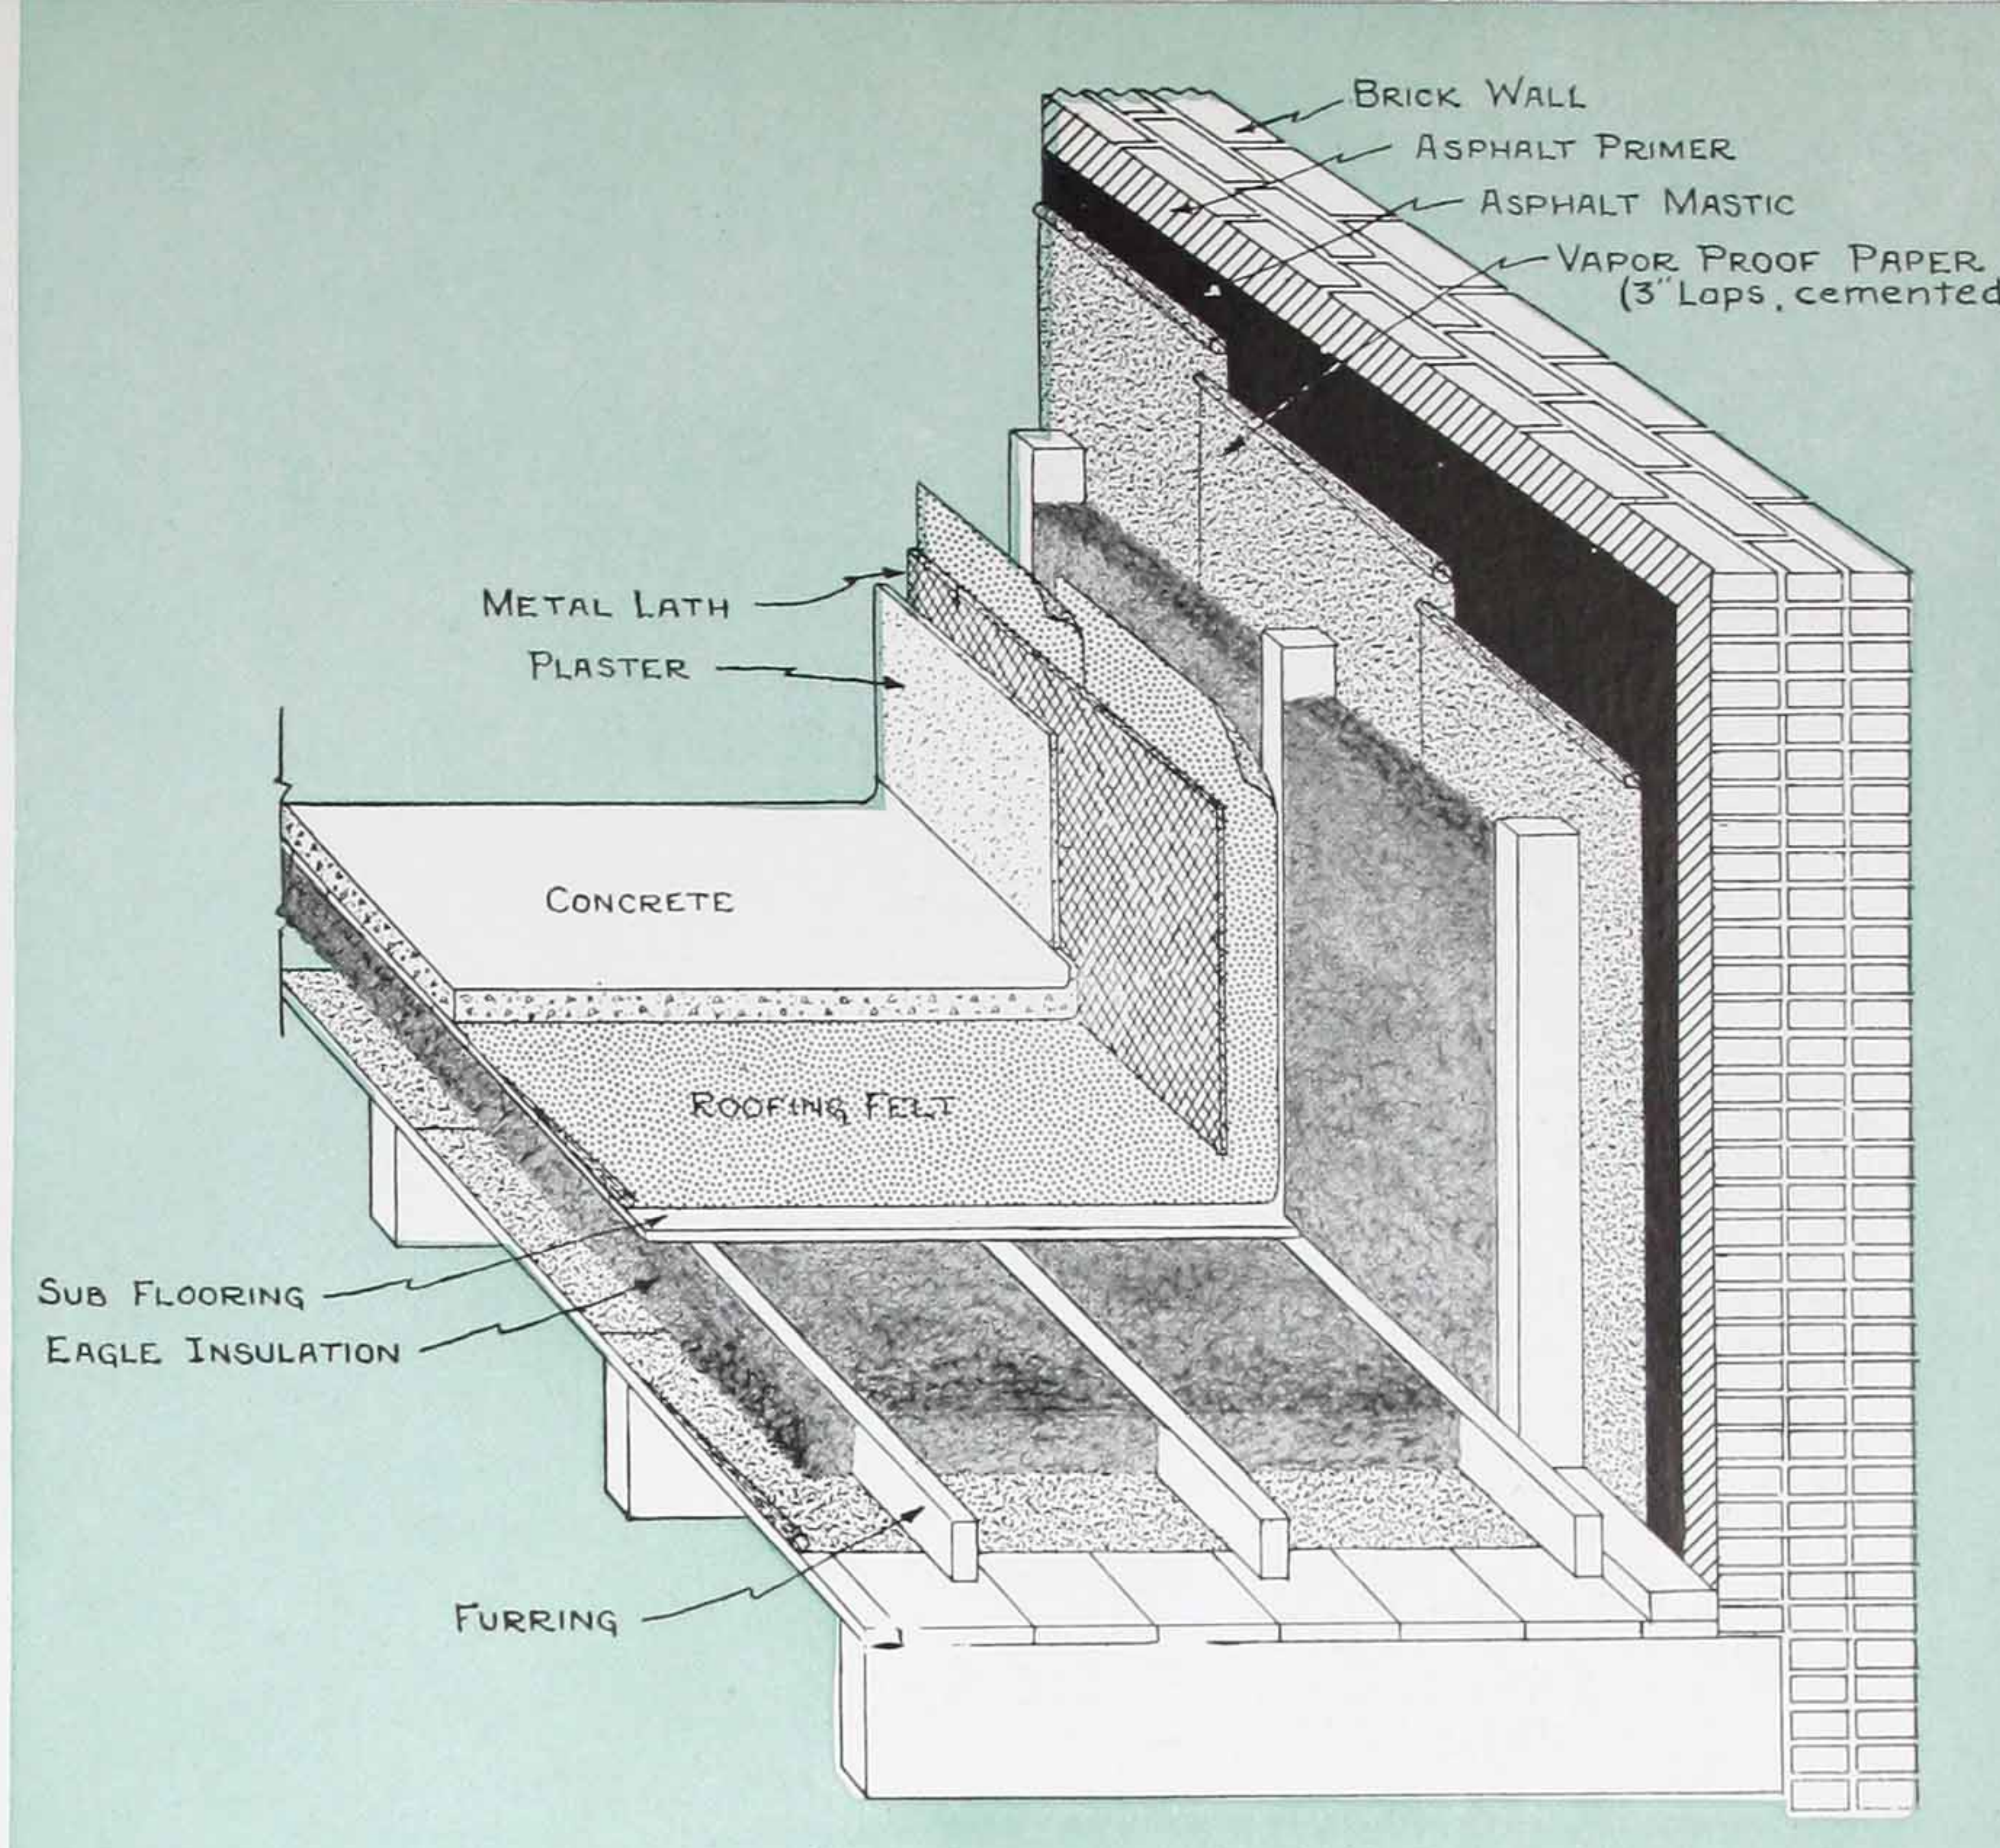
Concrete floor of general purpose refrigerators should slope 1" in 10'.
